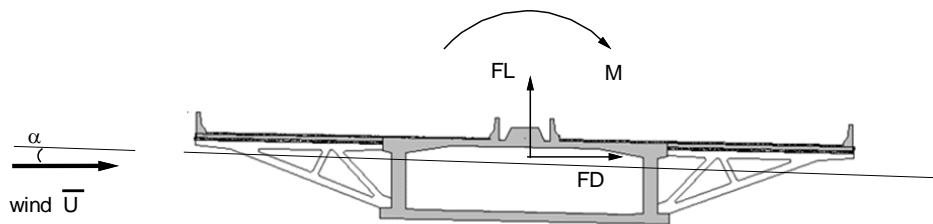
Deck cross-section of the bridge case example and aerodynamic force components.
